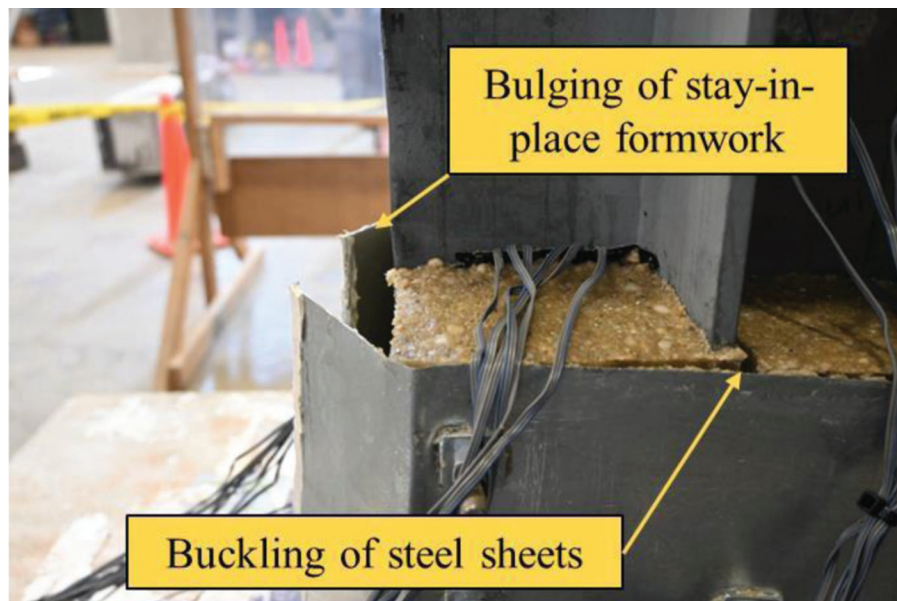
Specimen 7: buckling and bulging of steel sheets.
